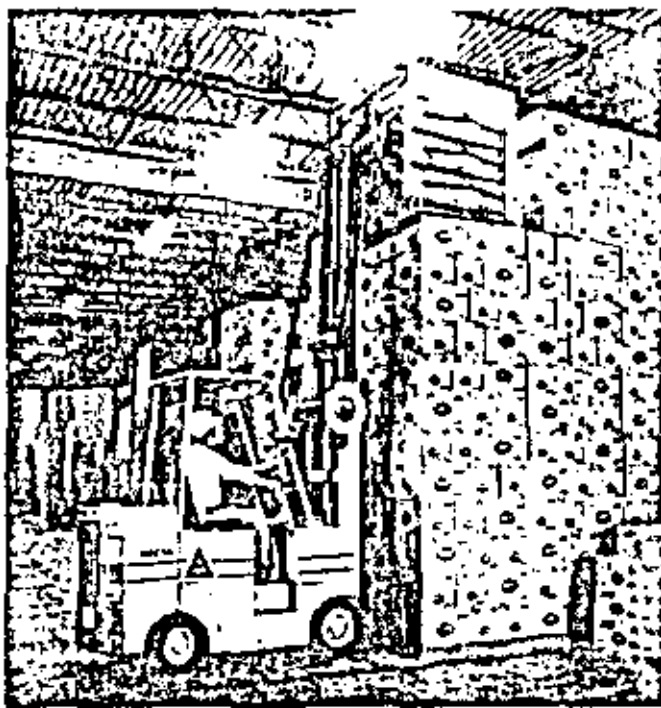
Traffic and load data are needed for design of industrial concrete floors on ground.
